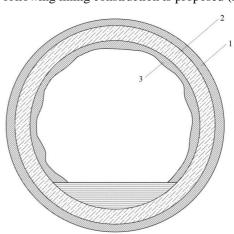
The proposed construction of a fiber-reinforced lining: 1 is the layer of reinforced foam concrete; 2 is the layer of precast fiber concrete; 3 is the sprayed concrete layer.
